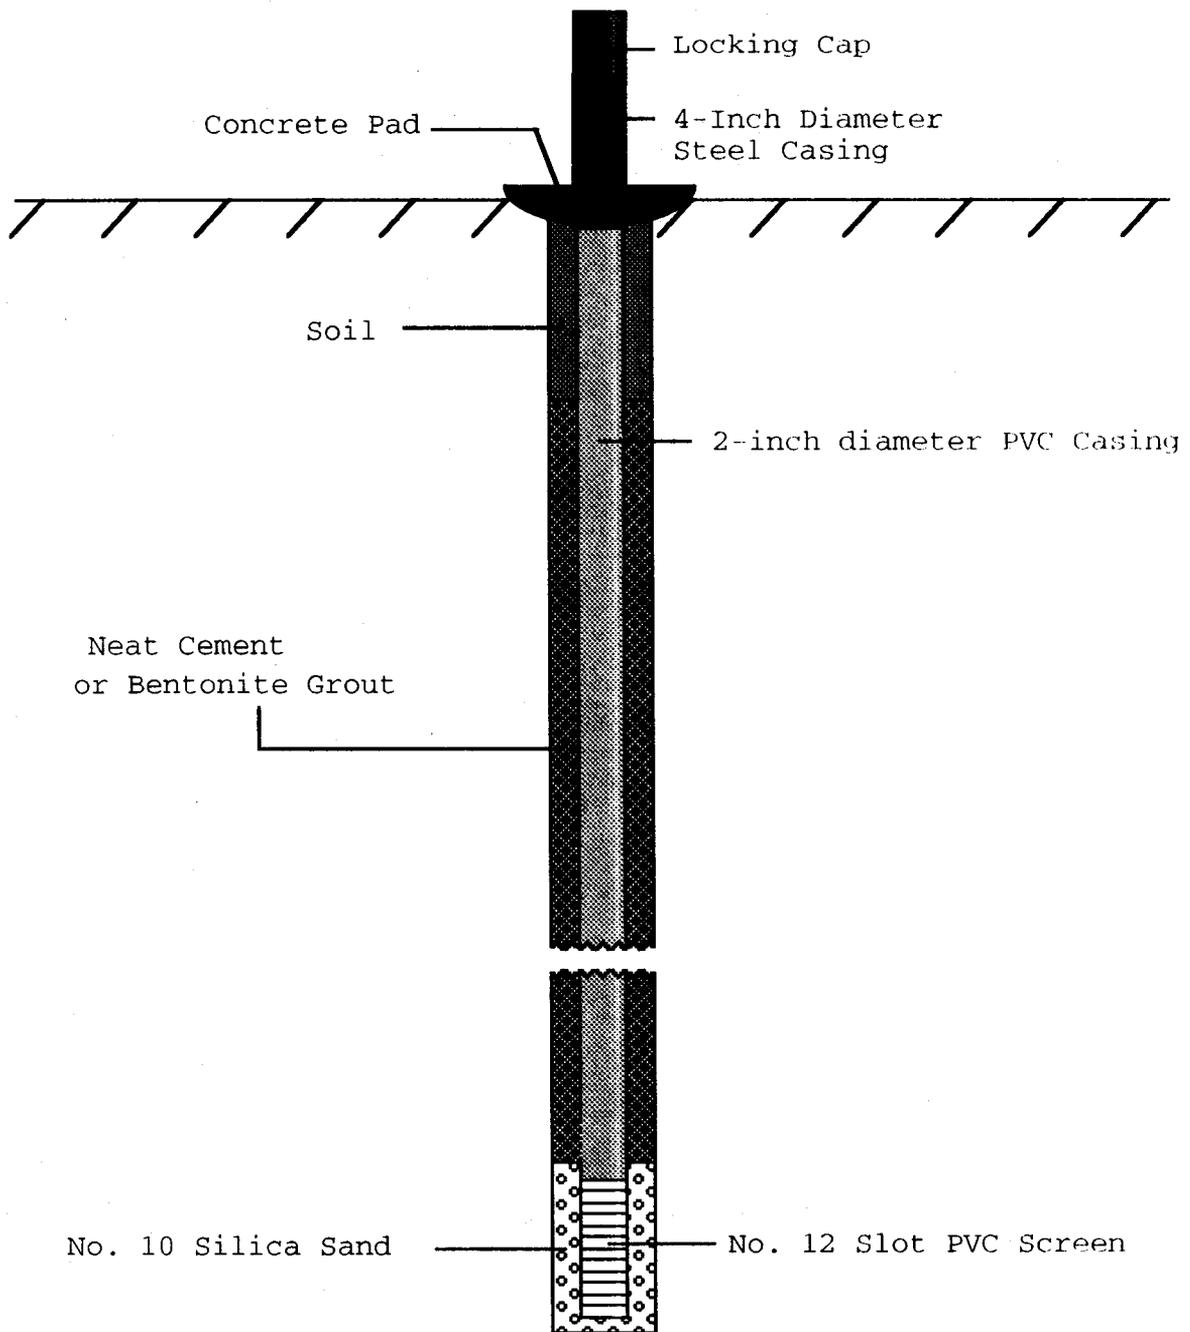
Construction design used for monitoring wells installed at the Dakota landfill.
